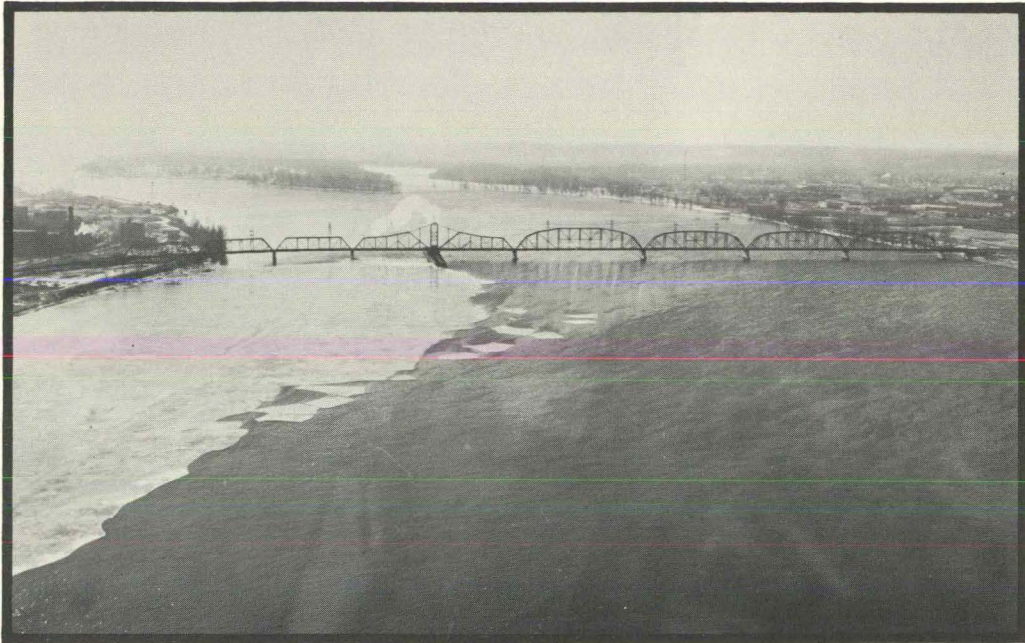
Looking downstream at the Davenport, Rock Island and Northwestern Railway bridge at Davenport, Iowa, Mile 481.4.
